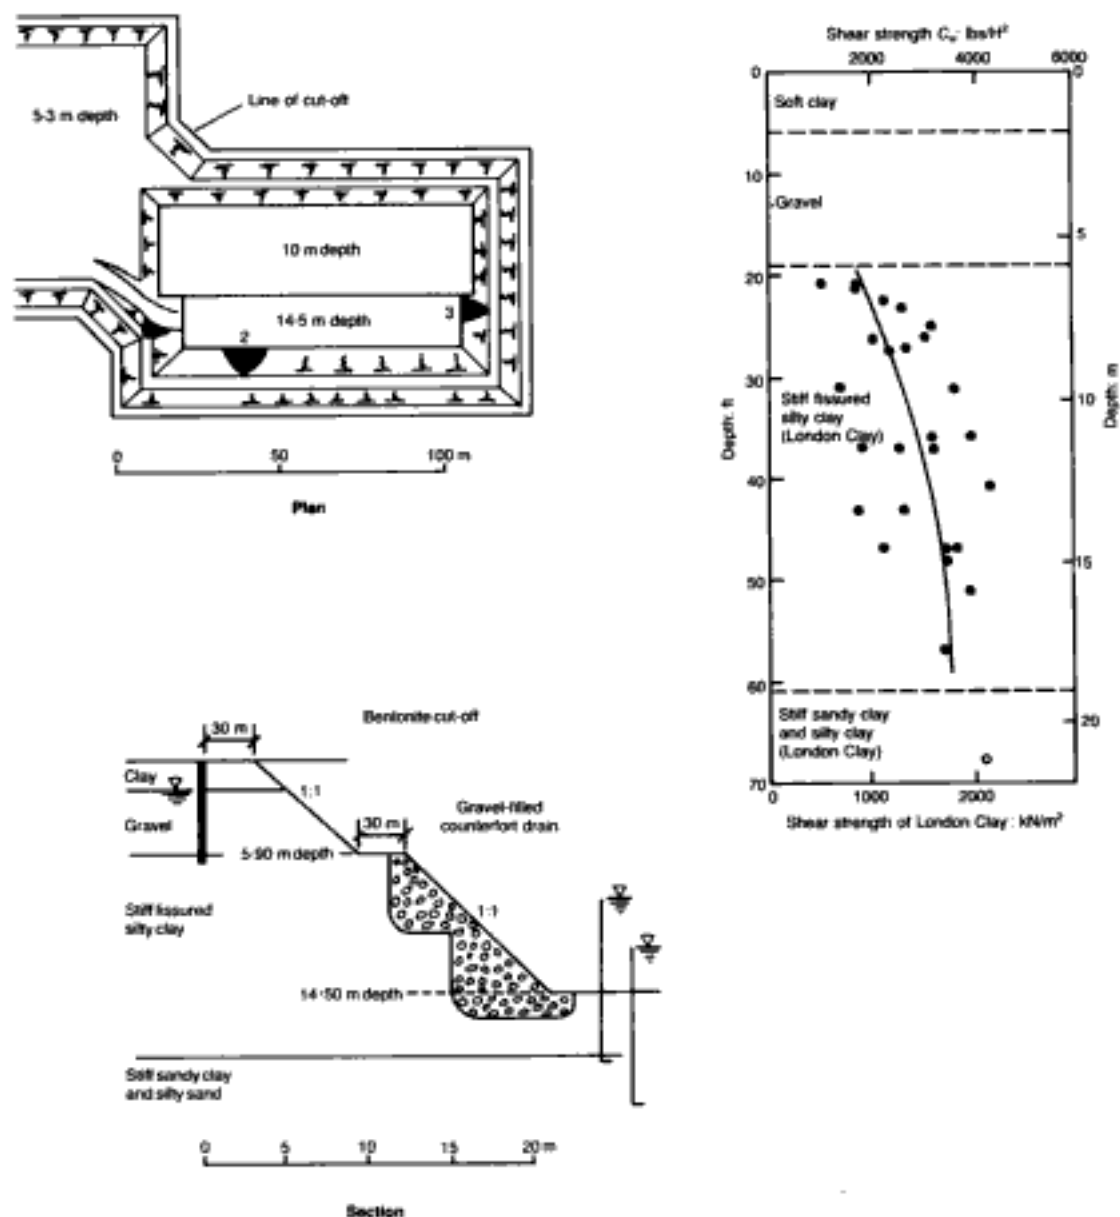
Plan and cross-section of a battered deep excavation into London clay (Wakeling²)
